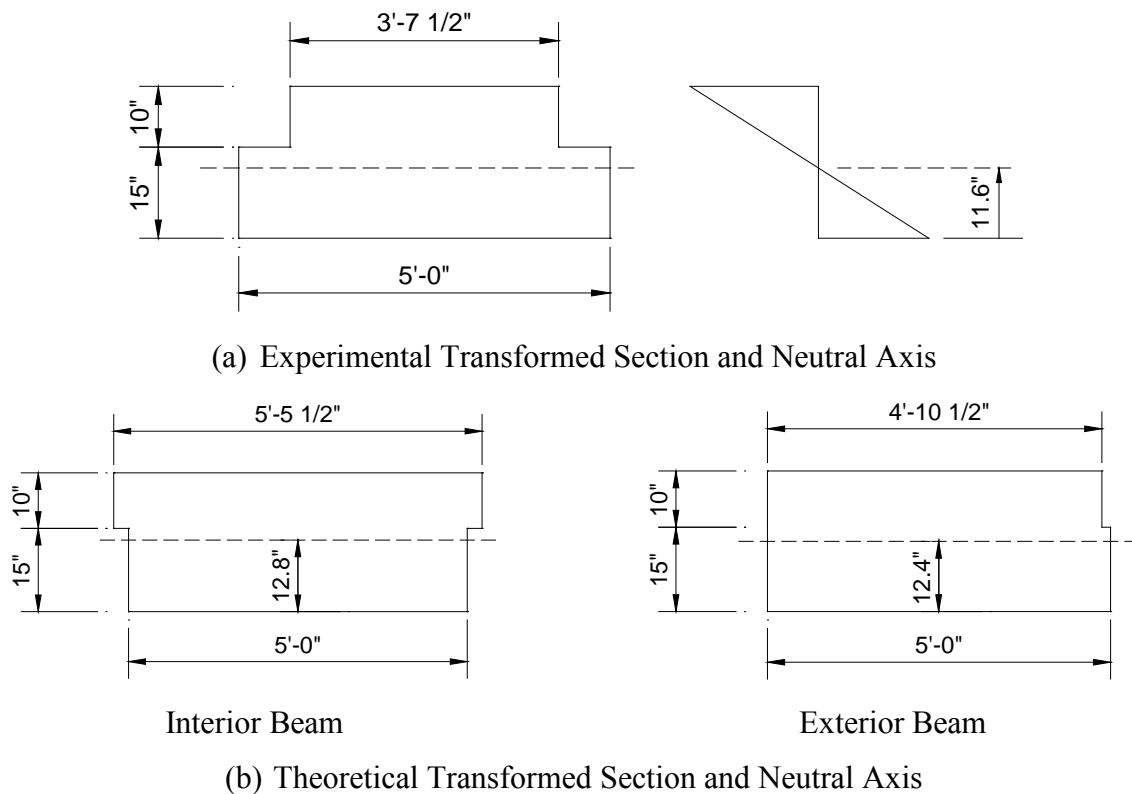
Transformed Section for Beams without the Sidewalk and Guardrail.
